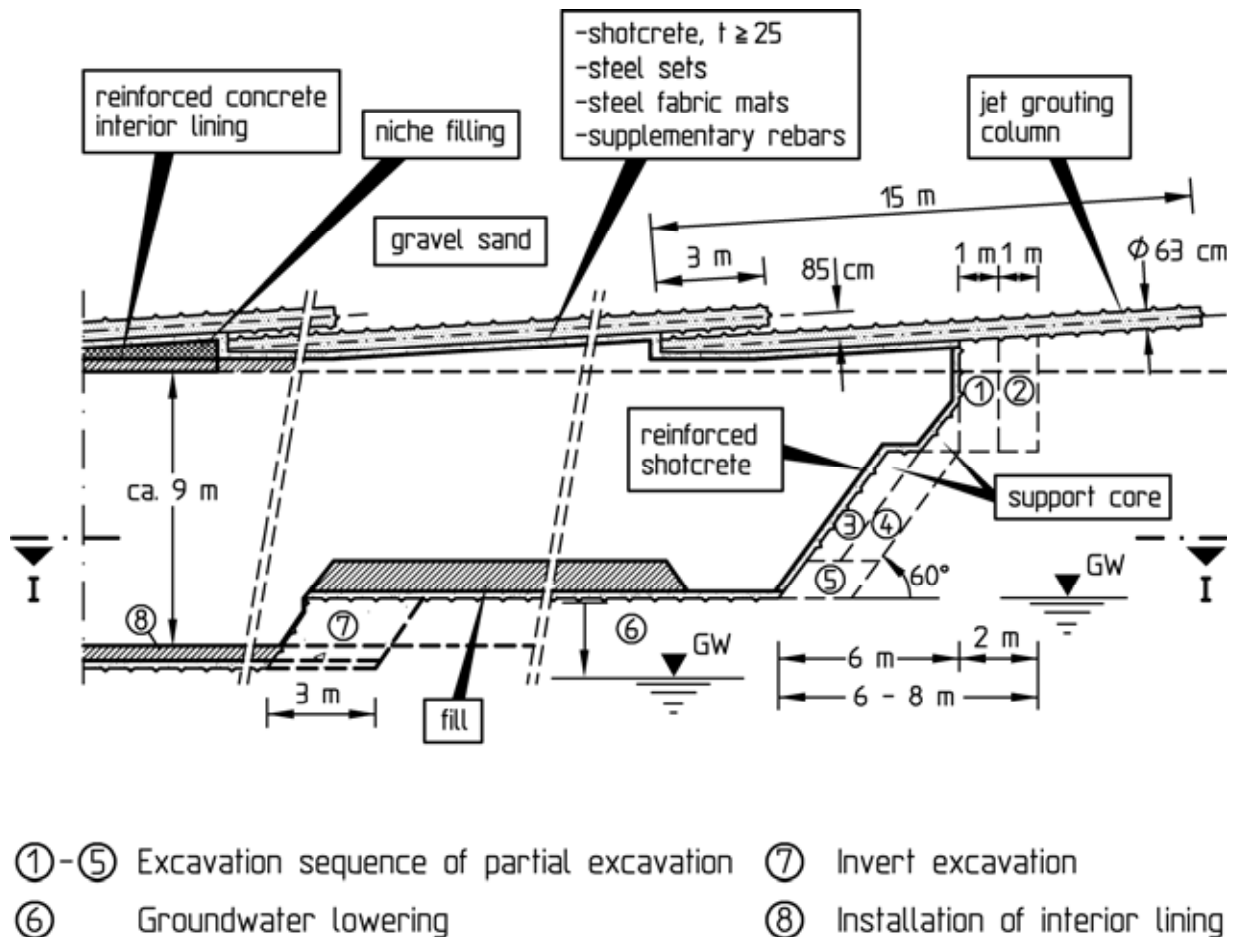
Heading of the two-lane tunnels, excavation and support, longitudinal section
